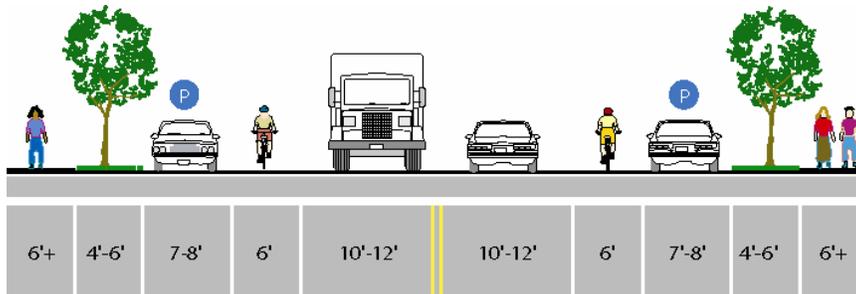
Bike Lane with On-Street Parking on Moderate Volume Roadway
